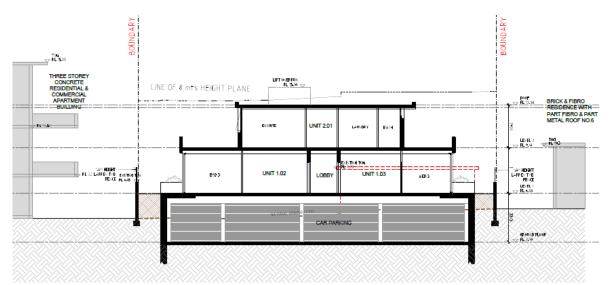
Section B plan DA300 extract showing the 3 storey building elements
